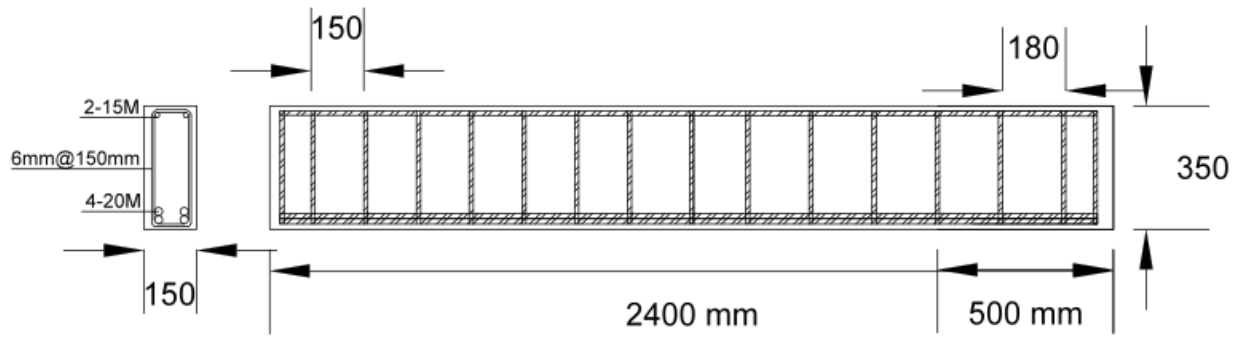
(a) Specimen geometry and reinforcement details – shear beams (dimensions in mm)
